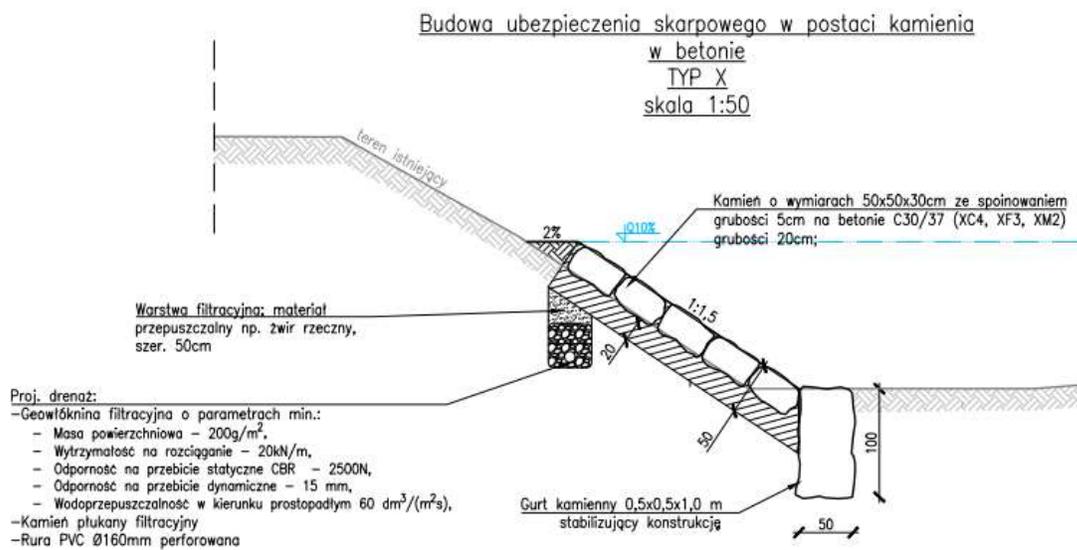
A typical cross-section of the revetment - X type - the right river bank at km 25+065 – 25+150.
